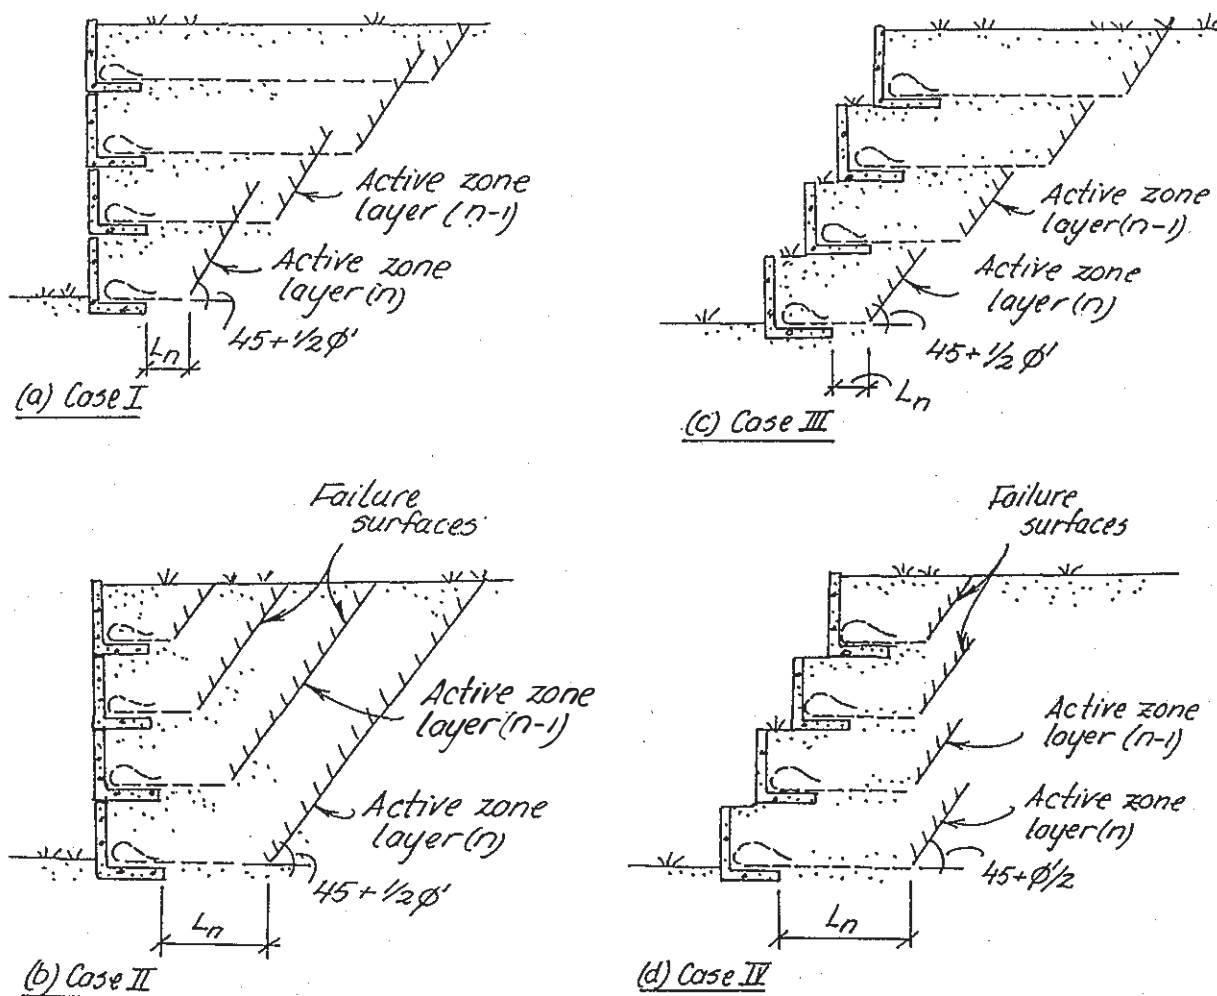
Fabric reinforced retaining wall (failure mechanisms)
